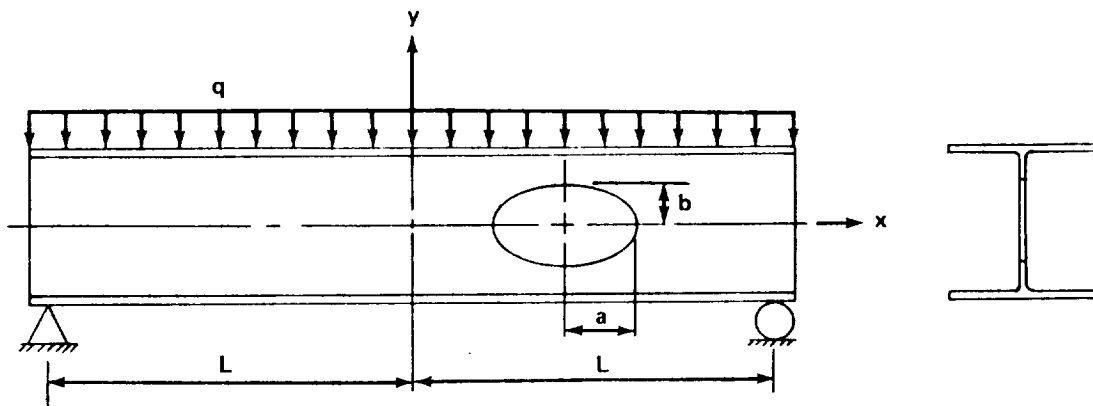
WIDE-FLANGE BEAM WITH A WEB HOLE.
